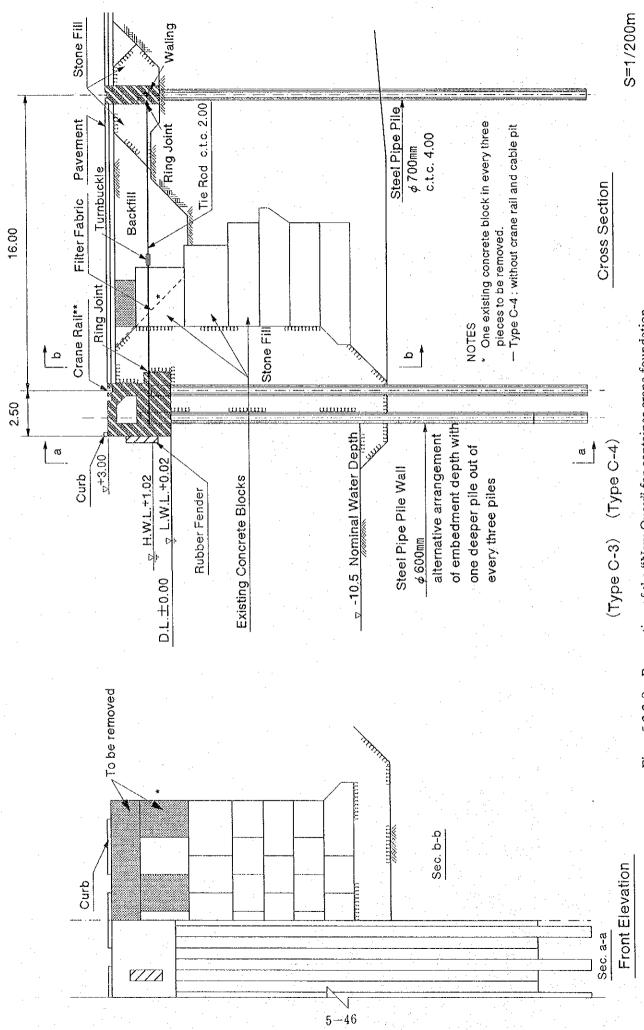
Renovation of the "New Quay" for container crane foundation
